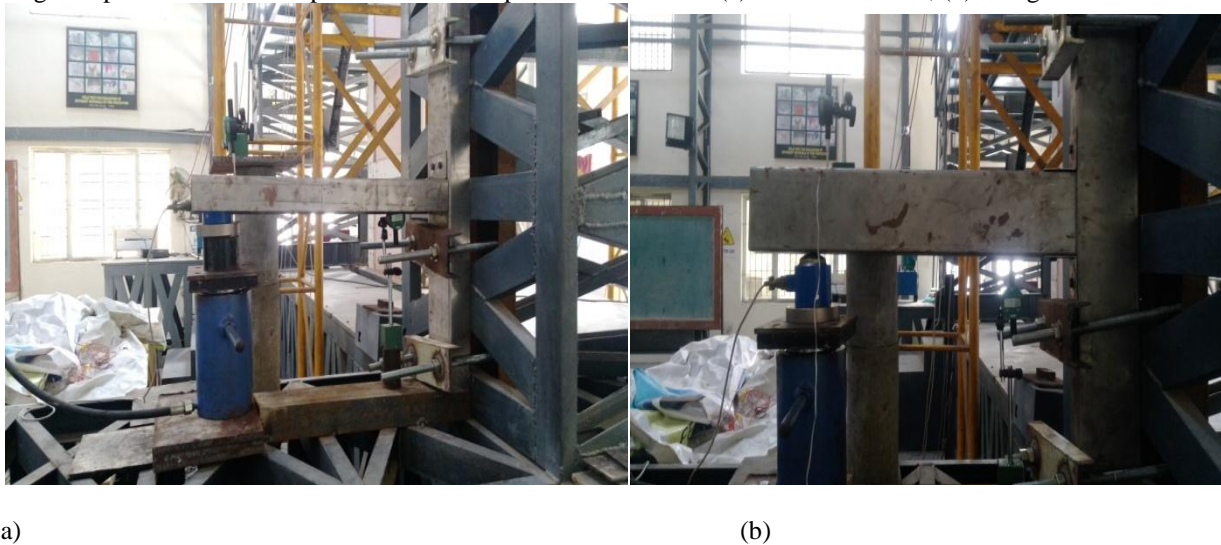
Experimental test setup Beam-Column specimens- Channel section (a) Web connection, (b) Flange connection.
